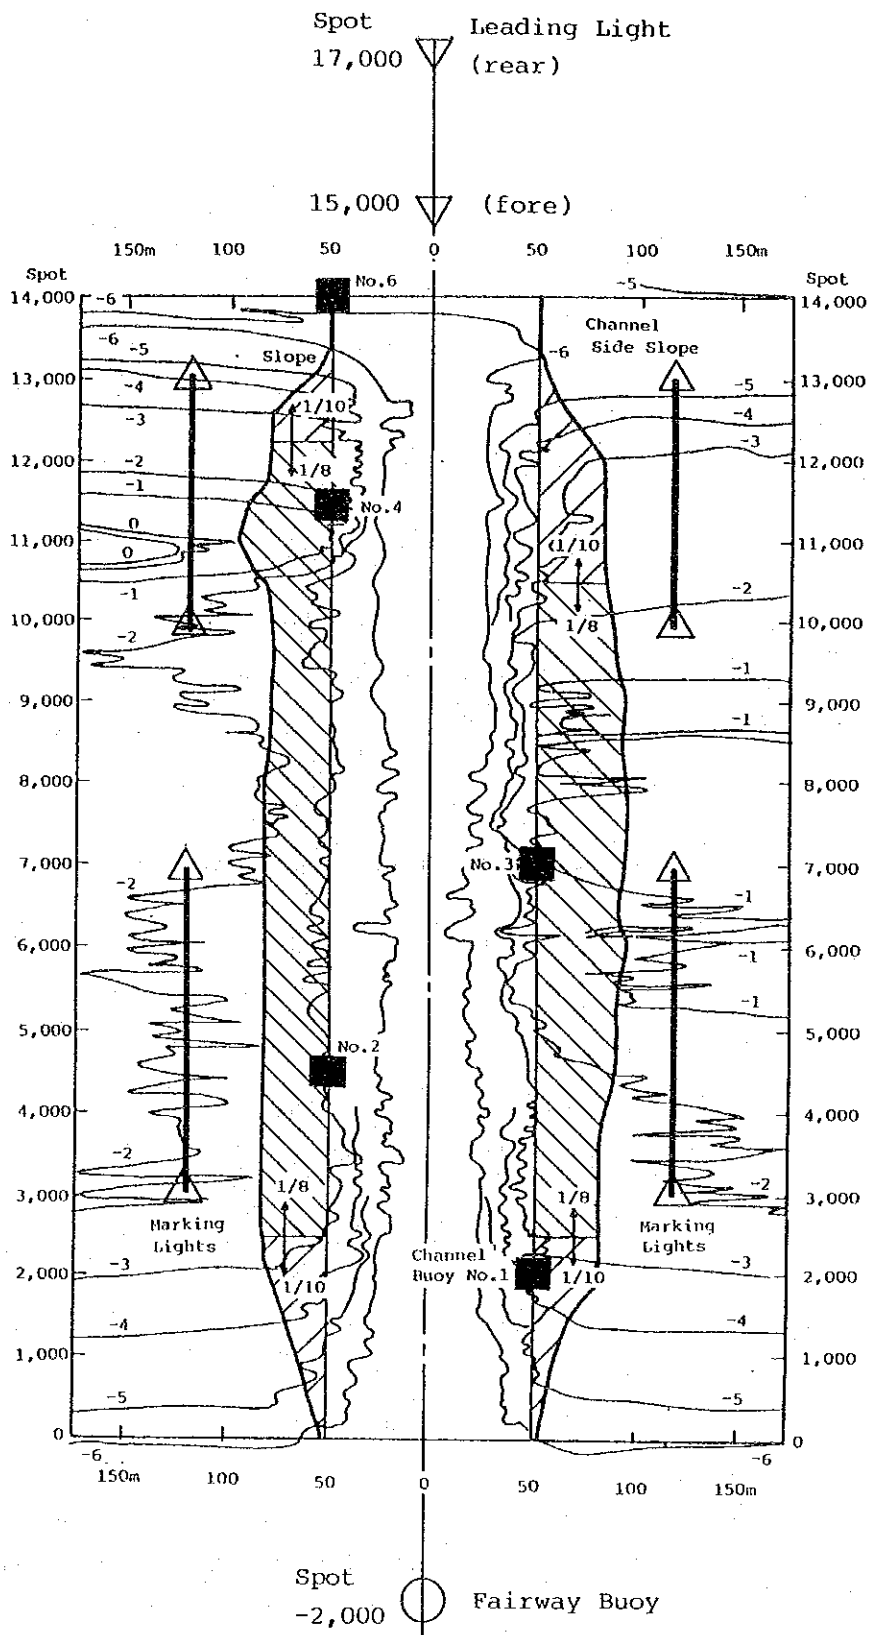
Arrangement of Submerged Walls and Navigational Aids (First-stage Plan)
